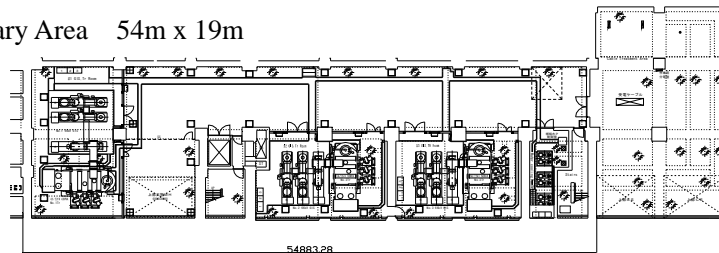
Example of Compact Underground Substation (B3 Floor)
